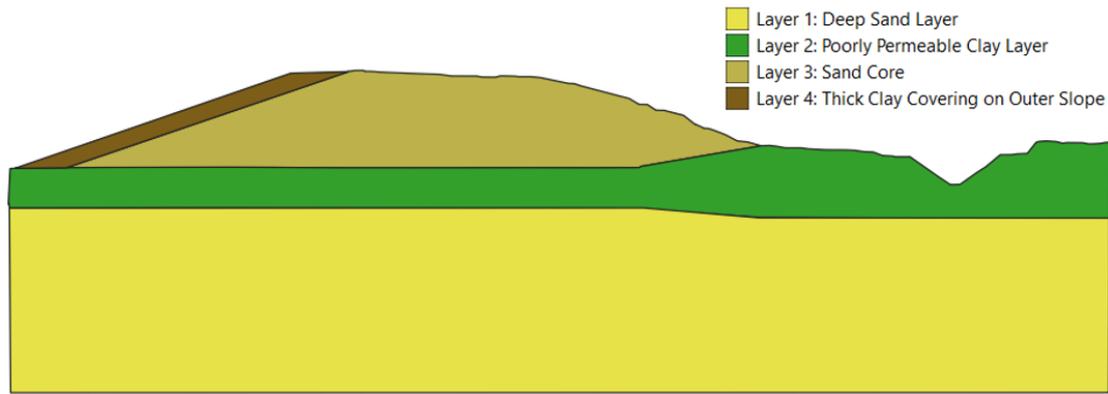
, The cross section to be studied (provided by Witteveen+Bos)
